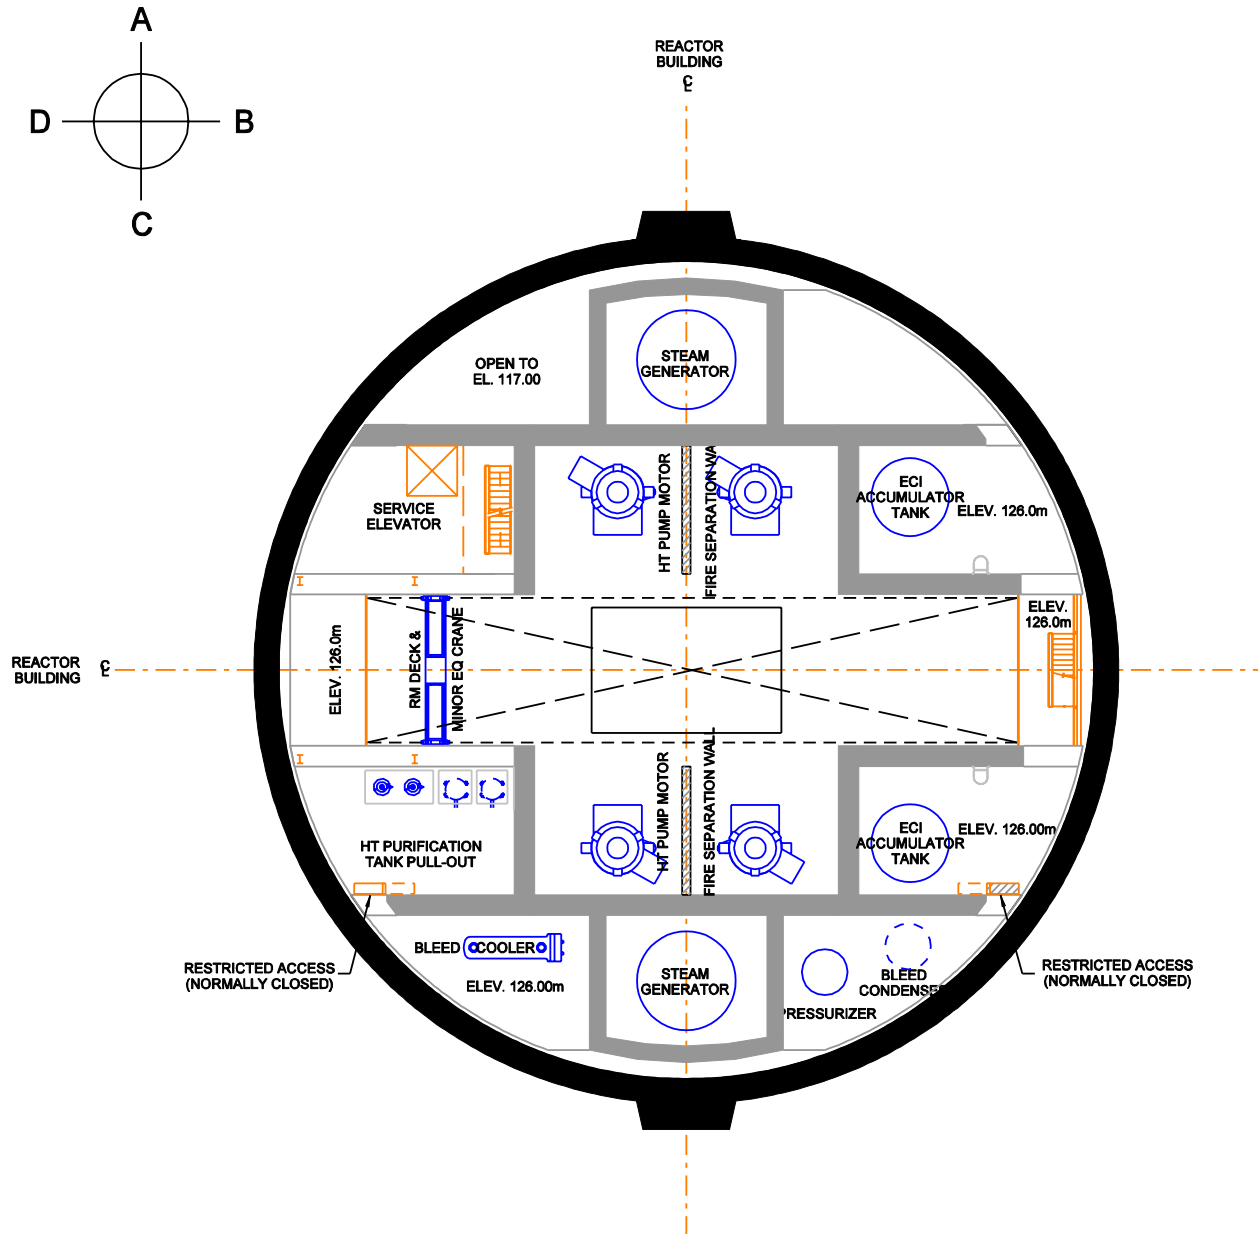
ACR-700 Reactor Building - Plan @ Elevation 125.4
